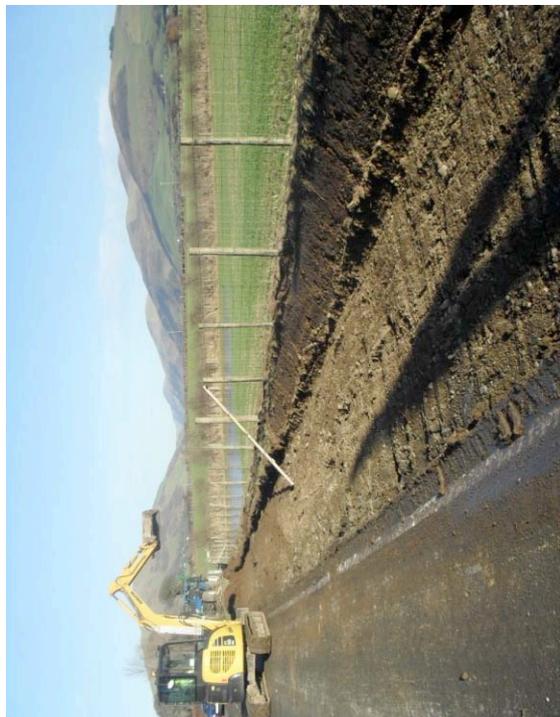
Section 2. General shot of undulating ground, battered section and collected water. 1m scale, Facing East.
